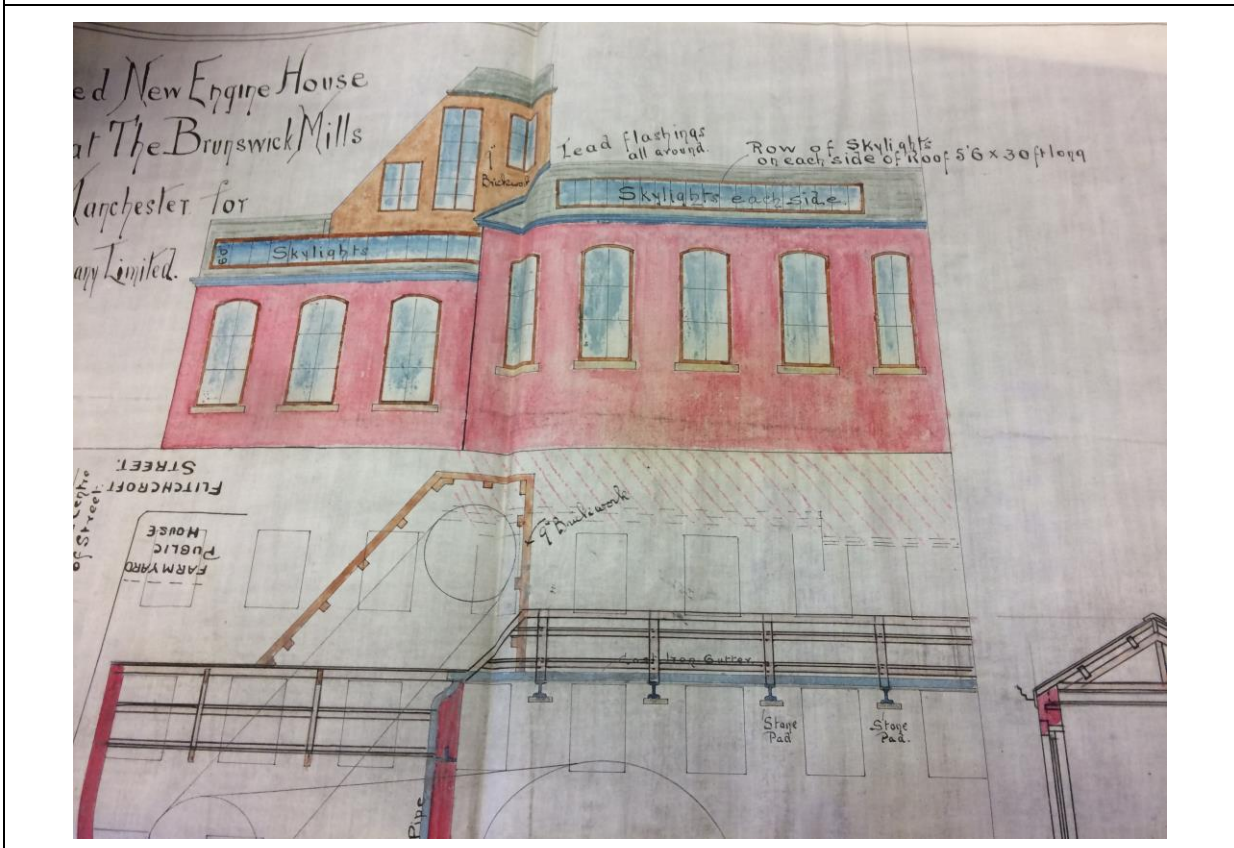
1906 proposed drawing of the principal elevation and section of the proposed (but not built) engine house to the courtyard.
